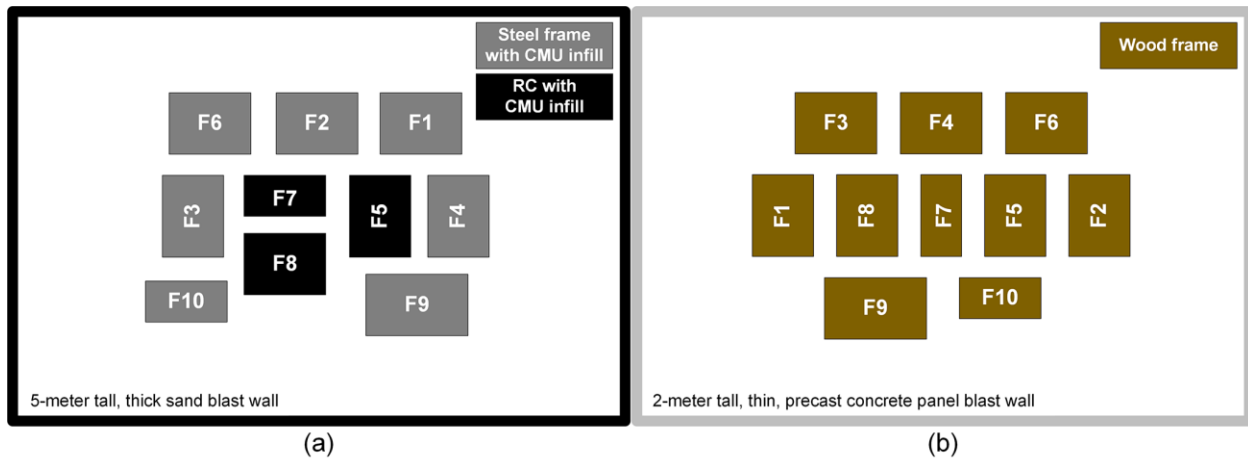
Site Layout Plan for Solutions (a) S1 and (b) S72
